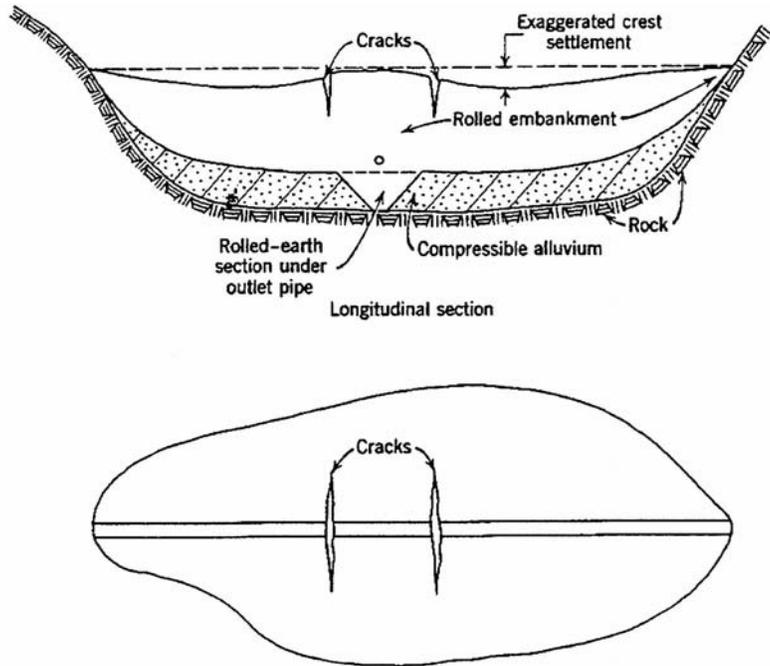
A. – Cracking due to differential settlement between natural foundation soil and rolled-earth support under outlet pipe (or other discontinuity in the foundation).
